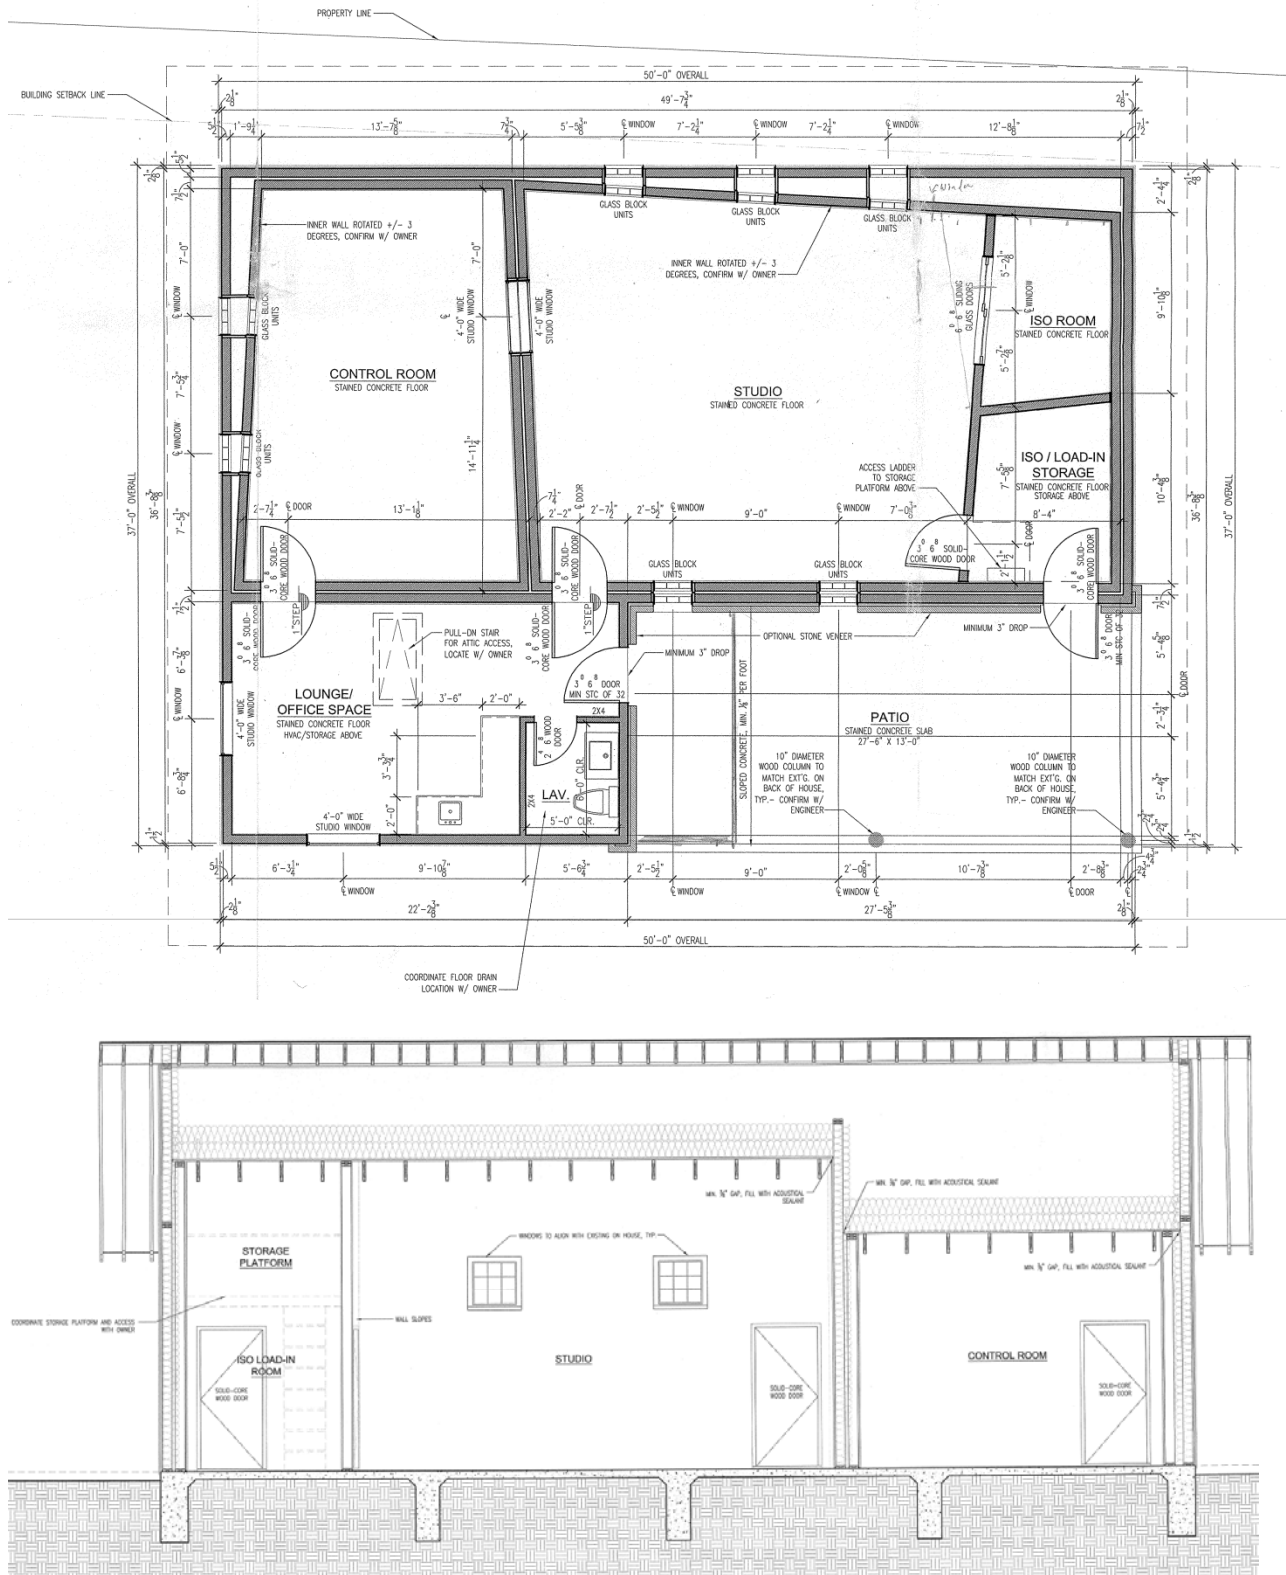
Floor plan (top) and Section (bottom) views of Austin Signal – note the splayed walls, and the room-within-a-room construction
